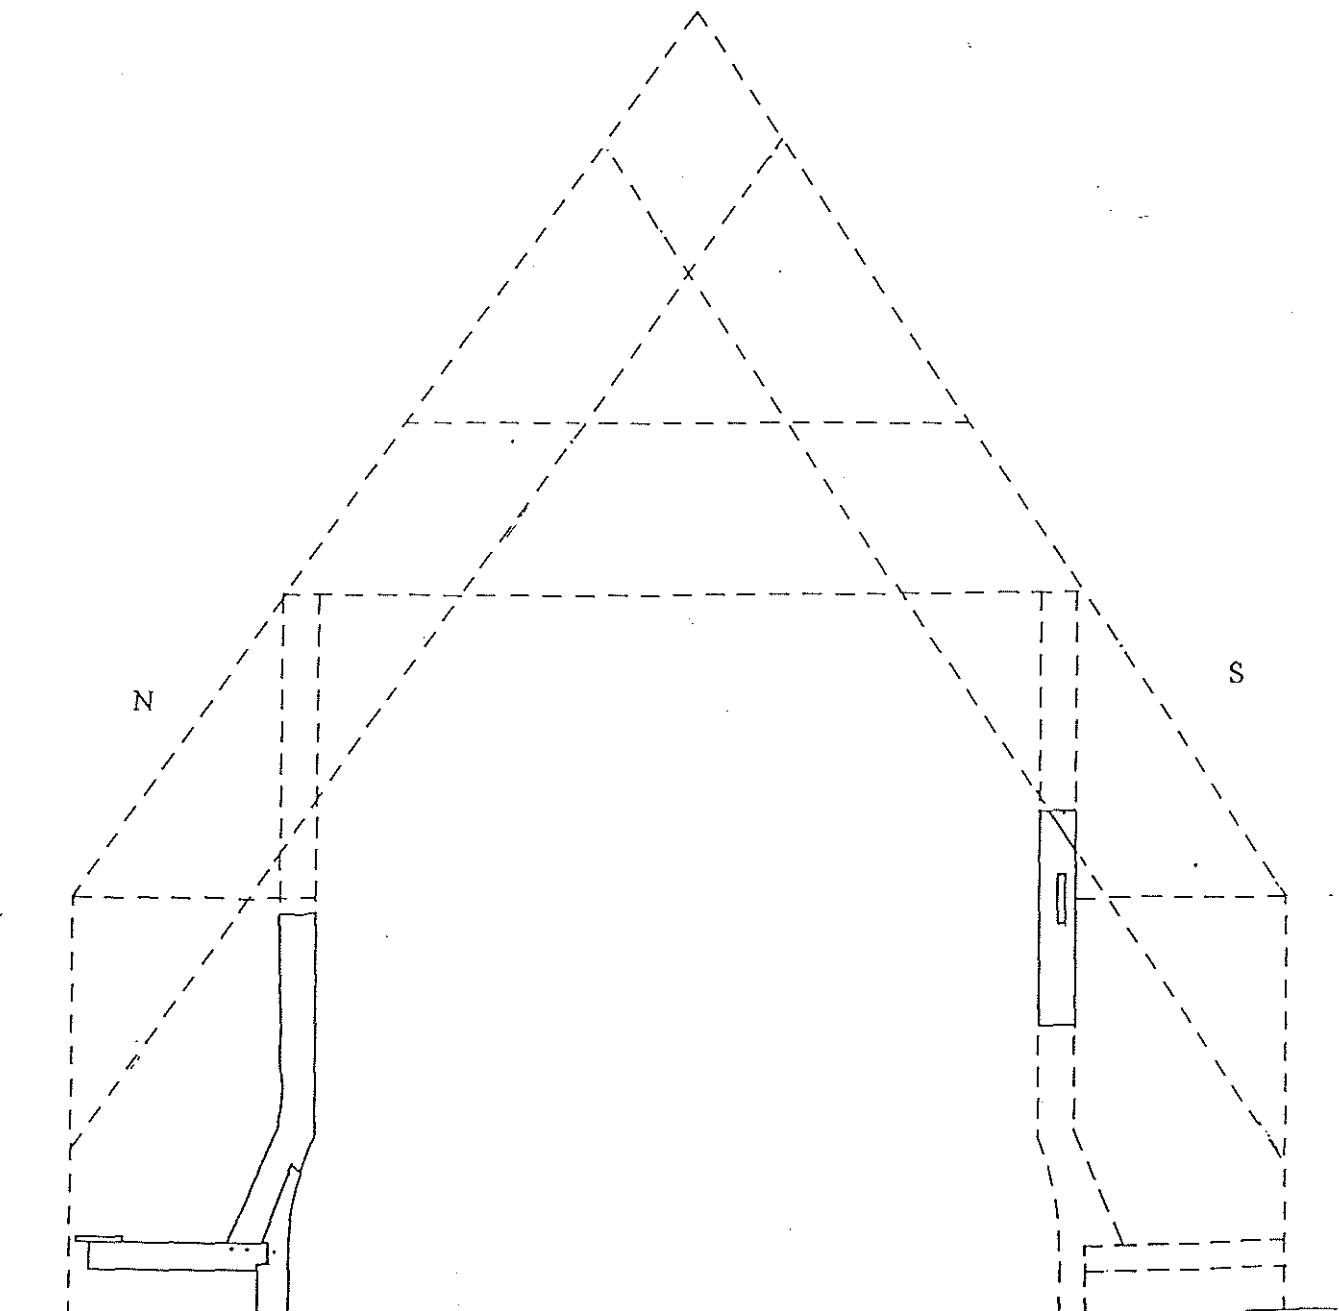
Drawing to show long section a – a of Abbey Farm cottage
